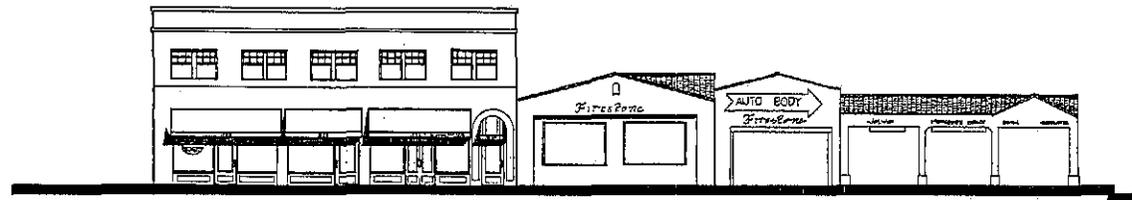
(Page 2) Existing Mission Street Elevations: South Side
